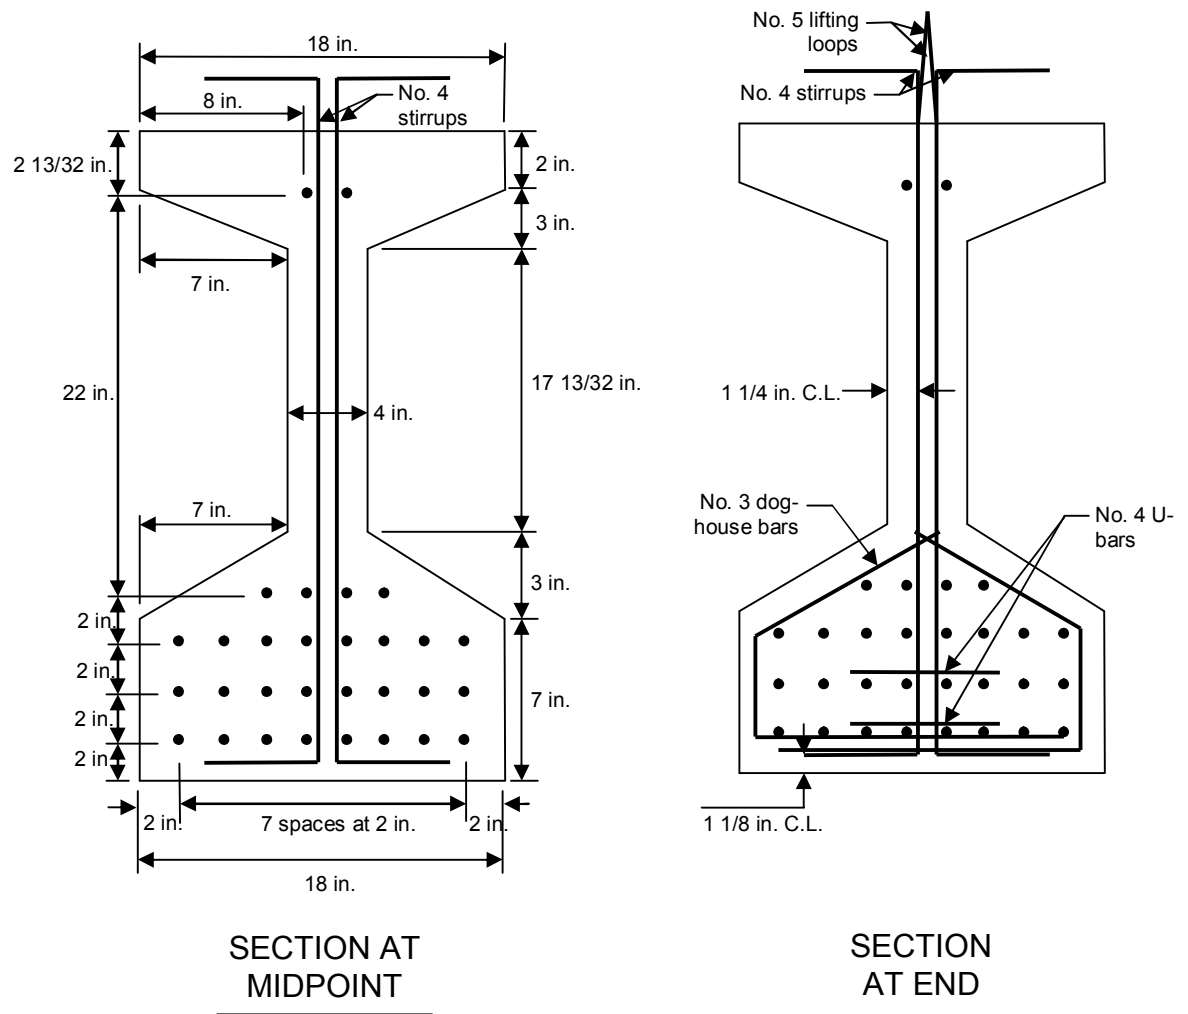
Design cross section for Girder 1 and Girder 2. As-built sections shown in Chapter 6.
